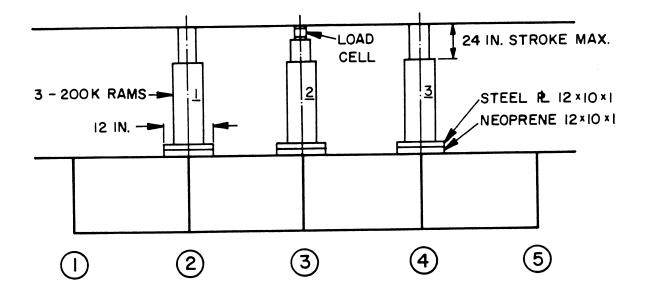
LOAD ARRANGEMENT AT MIDSPANS I AND II FOR FINAL LOADING TO FAILURE.
